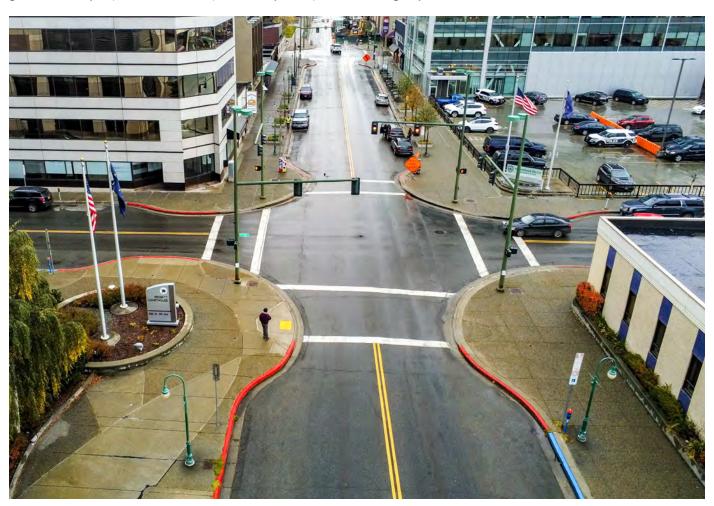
Curb Bulb-outs in Downtown Anchorage, Alaska
